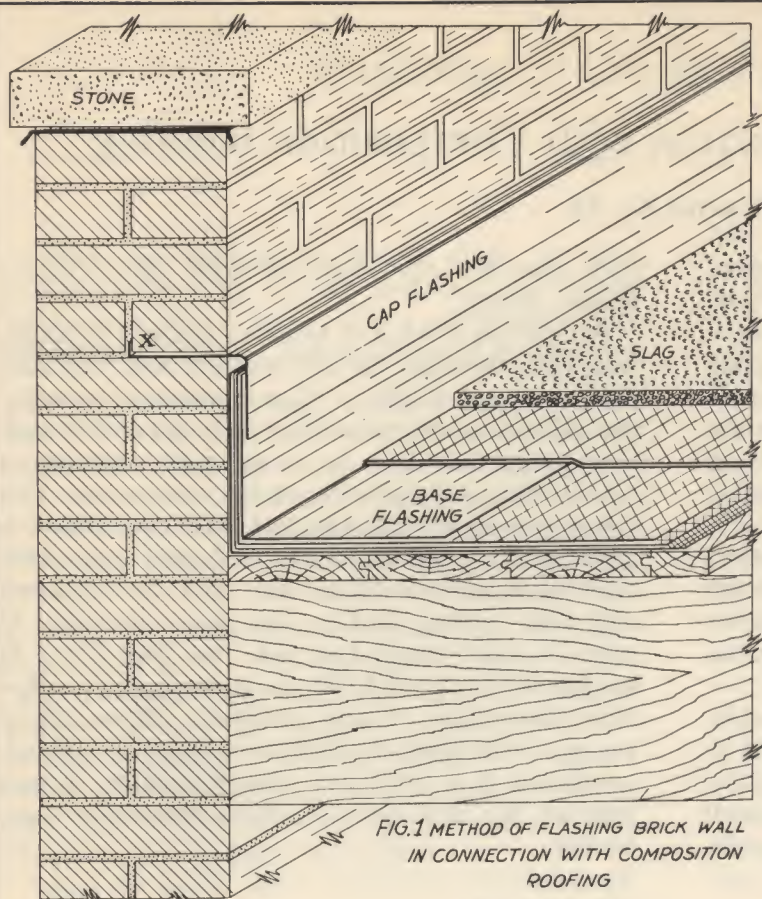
shows how the flashing is applied when the parapet wall is of brick and the main roof is covered with composition roofing. After the wall is built to the required height over the roof line, a cap flashing is laid, an edge turned up at *X*, which is built in as the masonry progresses.
